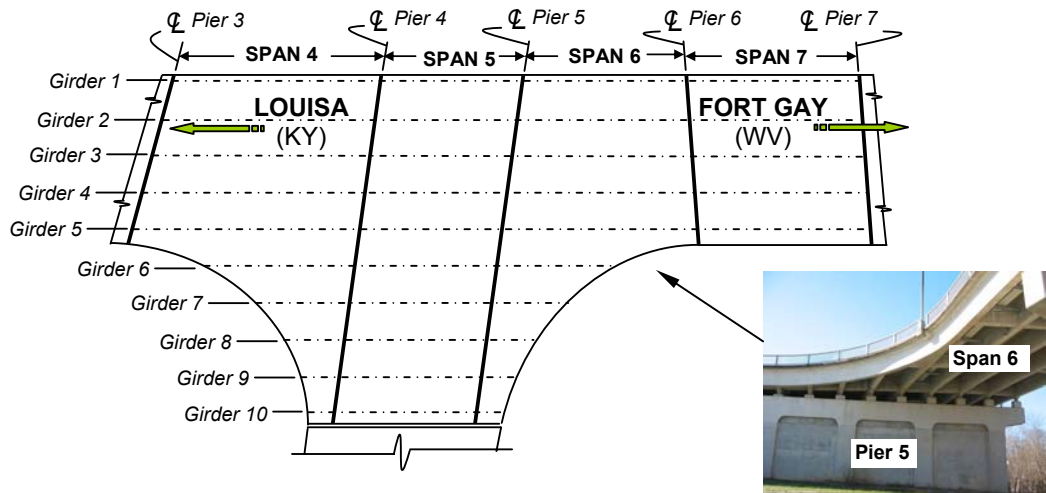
The reinforced concrete spans of the Louisa-Fort Gay Bridge.
